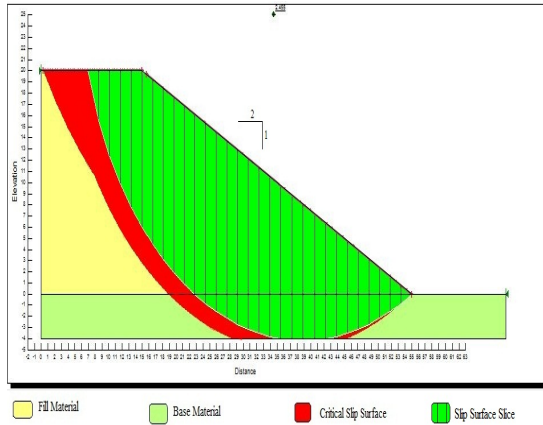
Typical cross sections of the embankment of 20m height with side slope of 1:2
